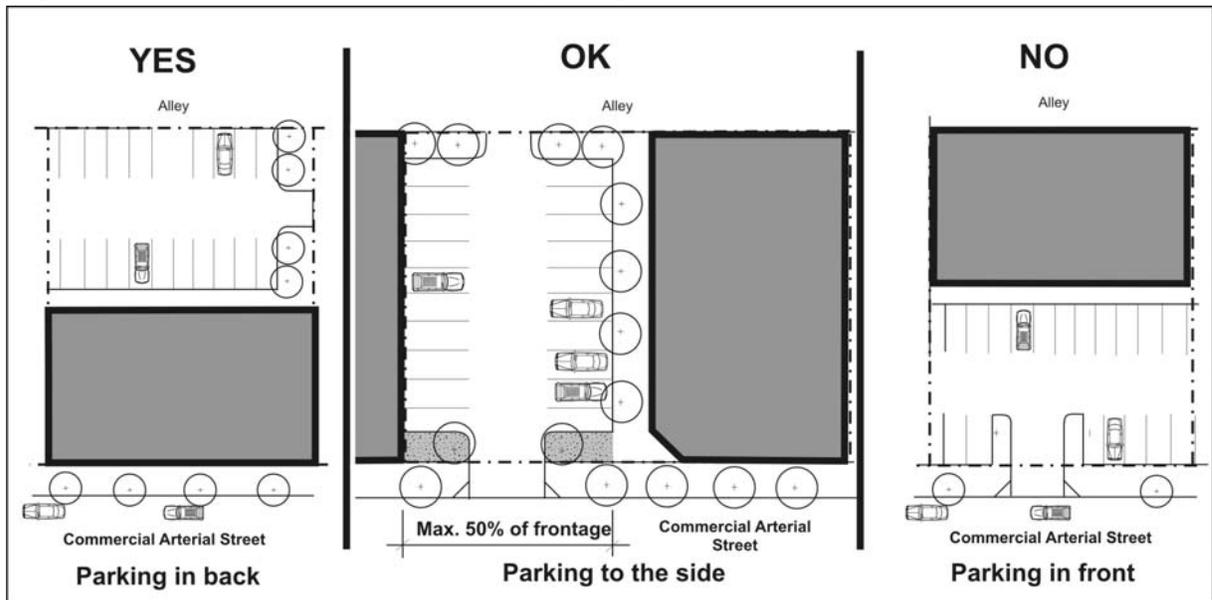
Desirable frontage examples along Commercial Arterial Streets.
